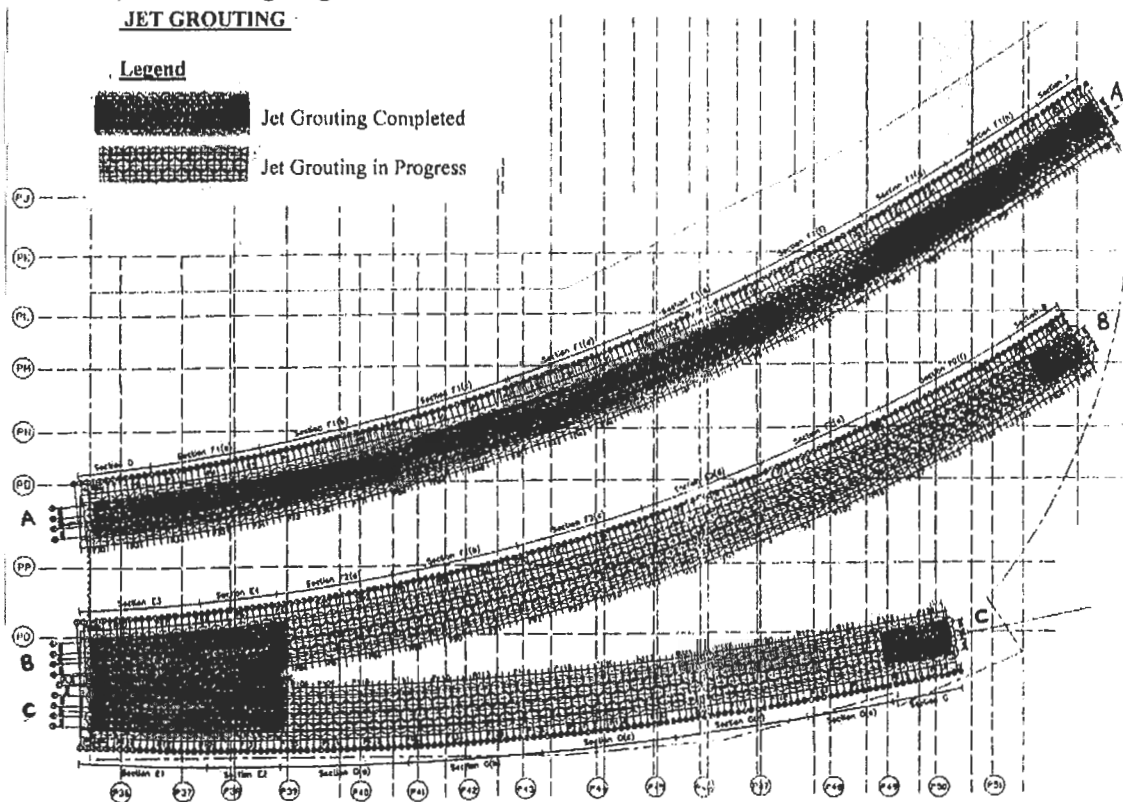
Layout of Jet Grouting Between the Diaphragm Walls in Tunnels 1, 2 and 3.
